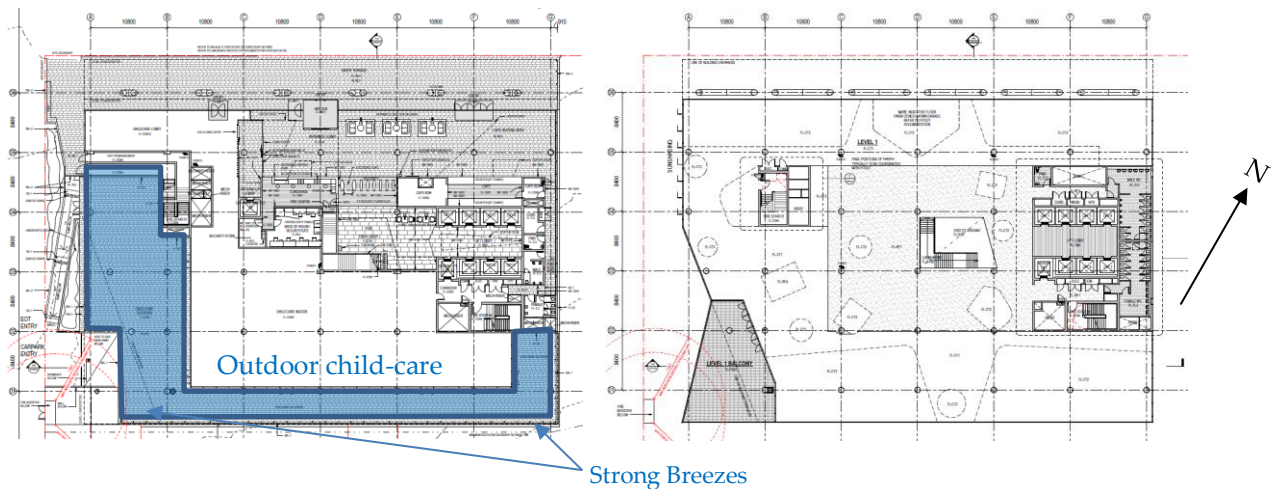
Ground (L) and Level 1 (R) plans of proposed development
